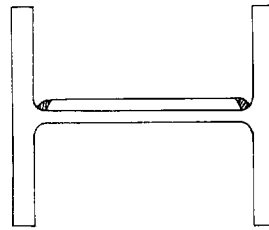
Welding detail for reinforcing plate on column web or vertical leg of wide seating angle
